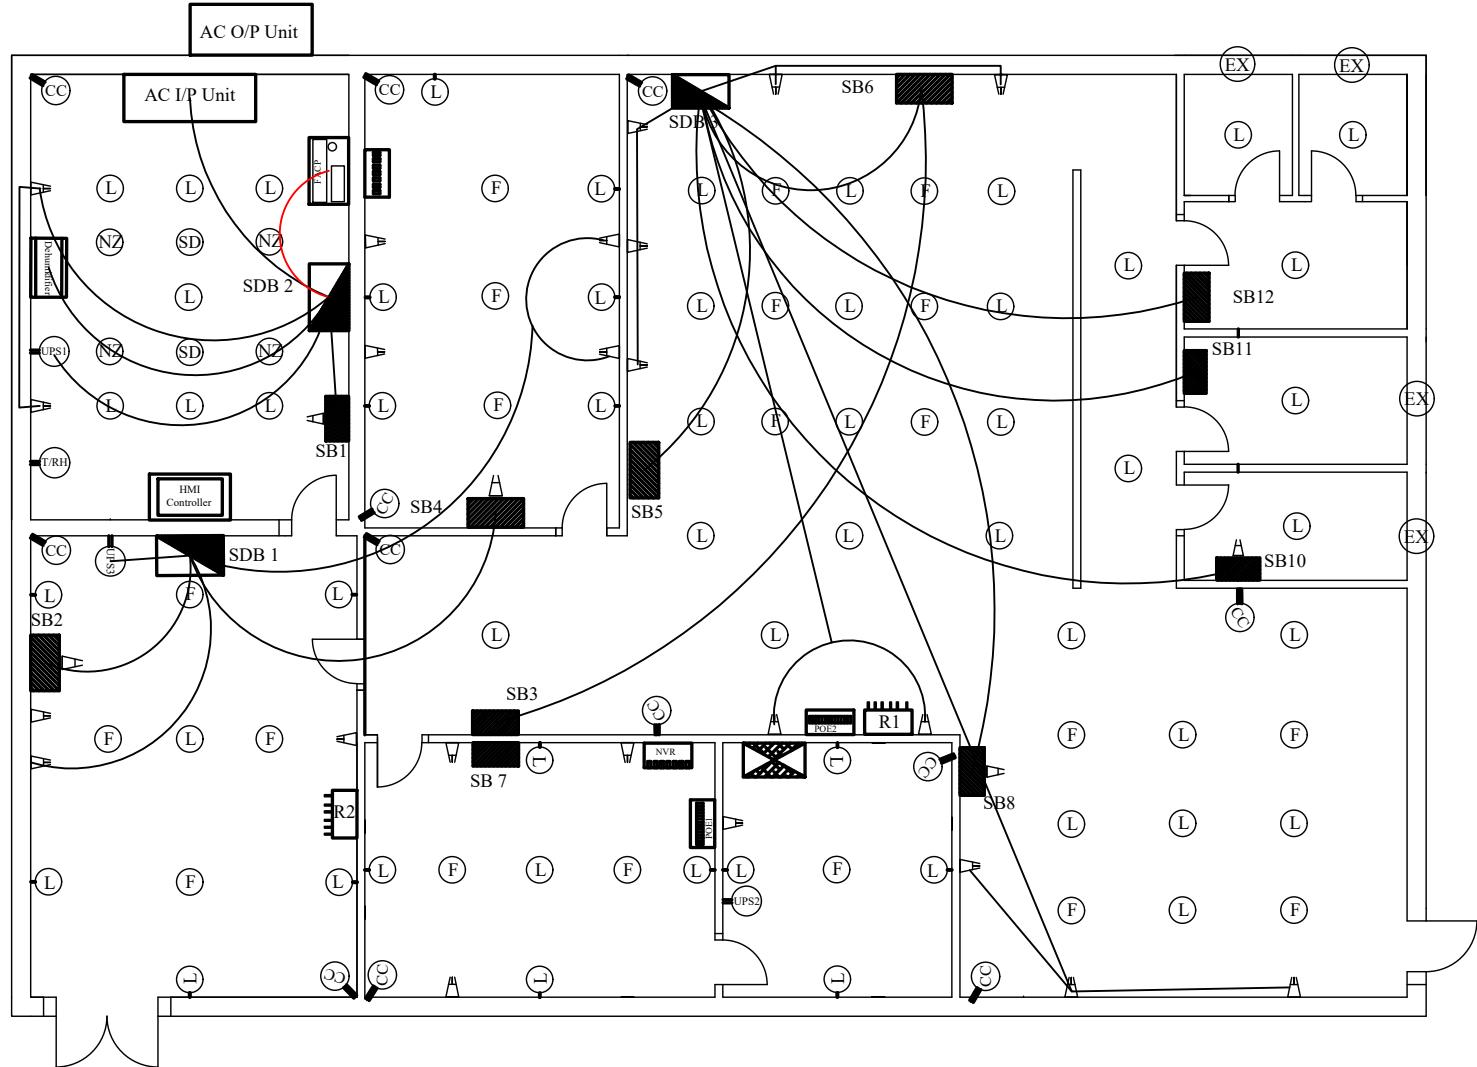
Conduit Layout: SDB to Switchboard Connections.
